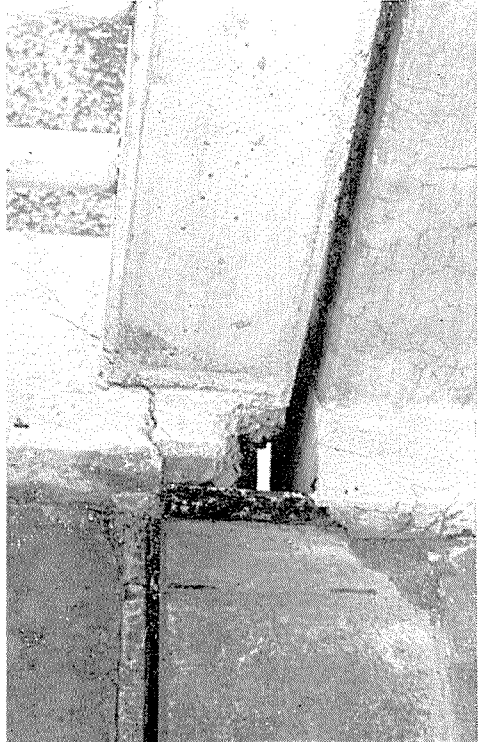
Cracking of abutment (Komatagawa Bridge)
